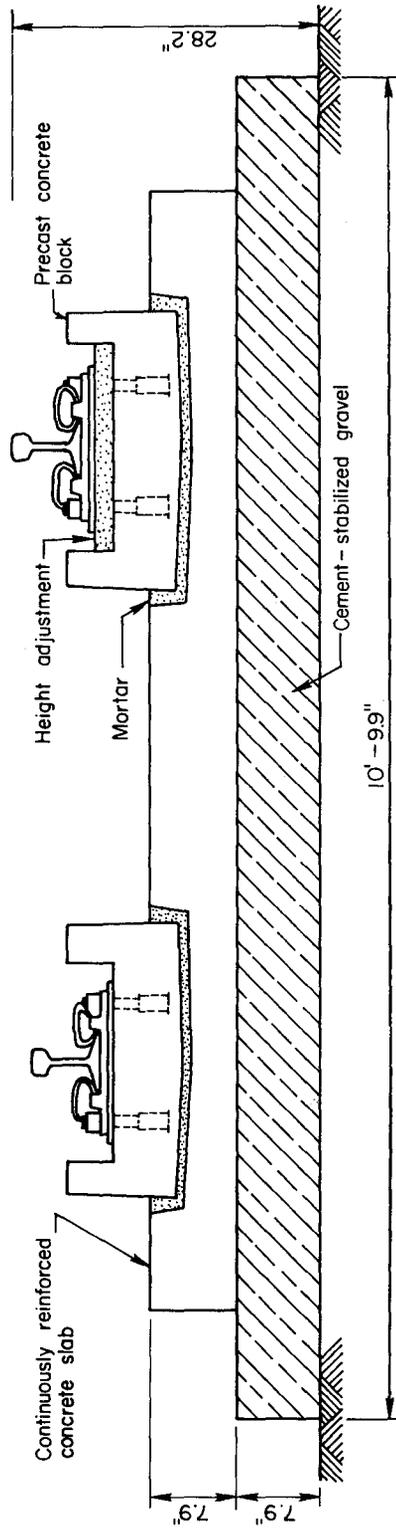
CROSS SECTION OF TRACK WITH CONCRETE BLOCKS SET INTO CAST IN-PLACE SLAB
